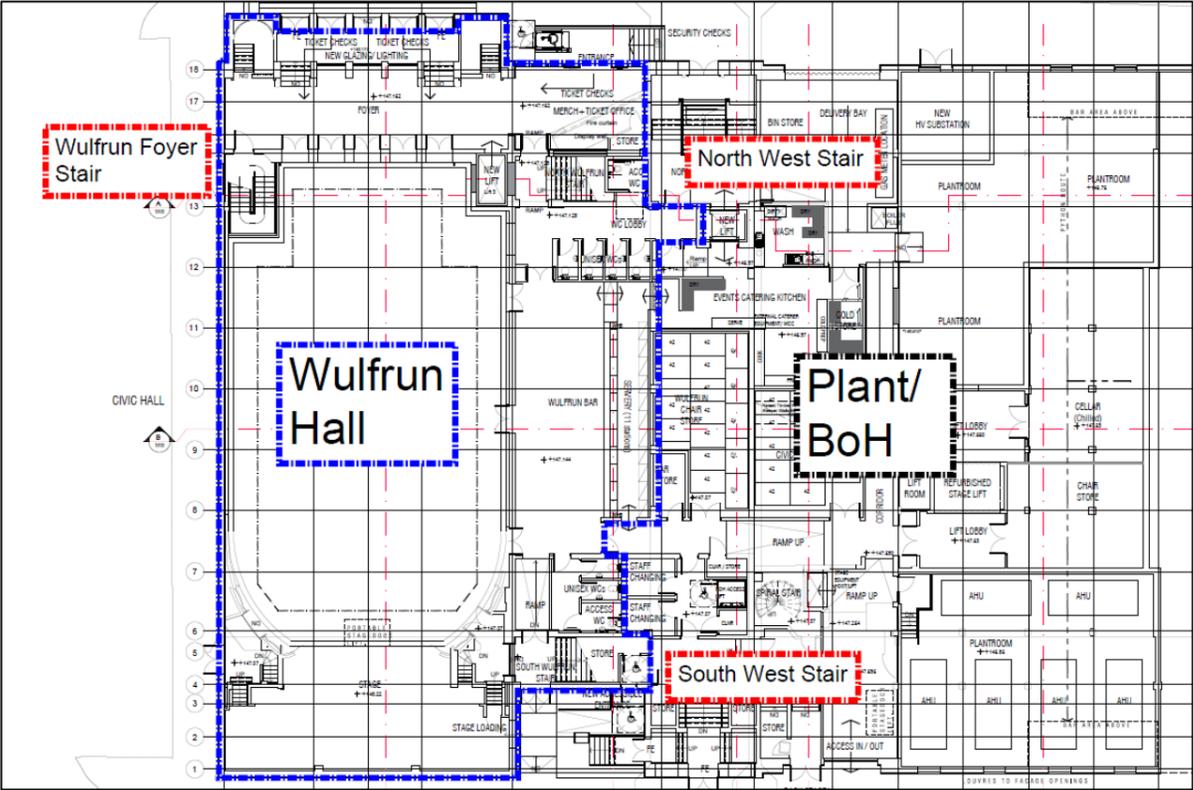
Schematic plan of the proposed lower ground floor (Wulfrun Hall)
